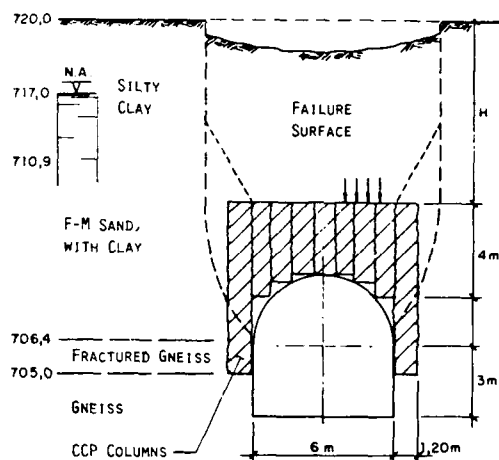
Profile of Sanegran Tunnel Collapse and Typical CCP Repair
